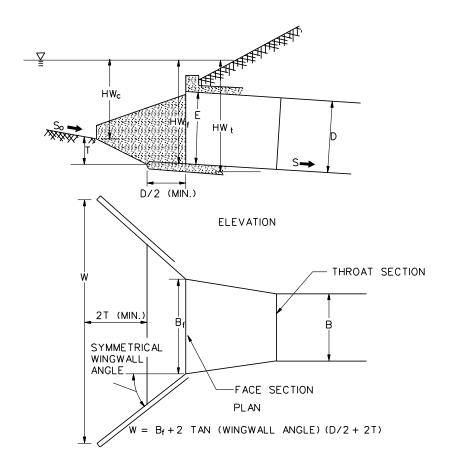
Side-Tapered Inlet with Upstream Depression Contained Between Wingwalls
